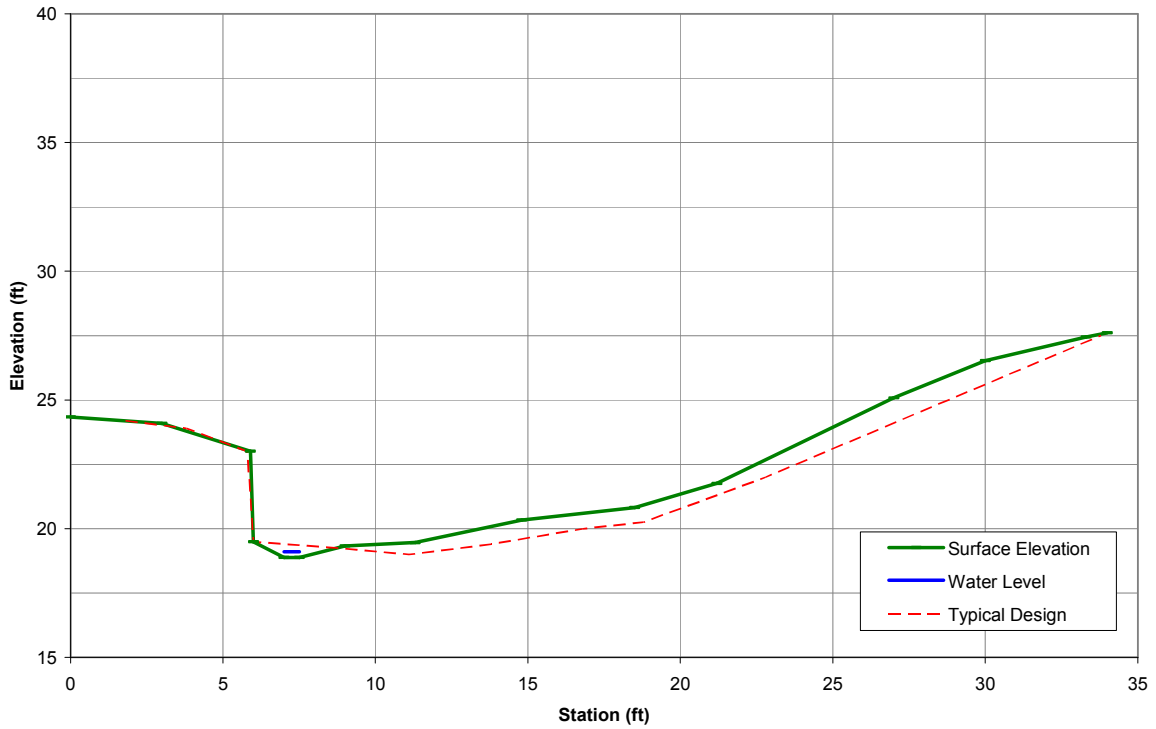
Cross Section A, STA 0+25 upstream from Kains Avenue culvert
